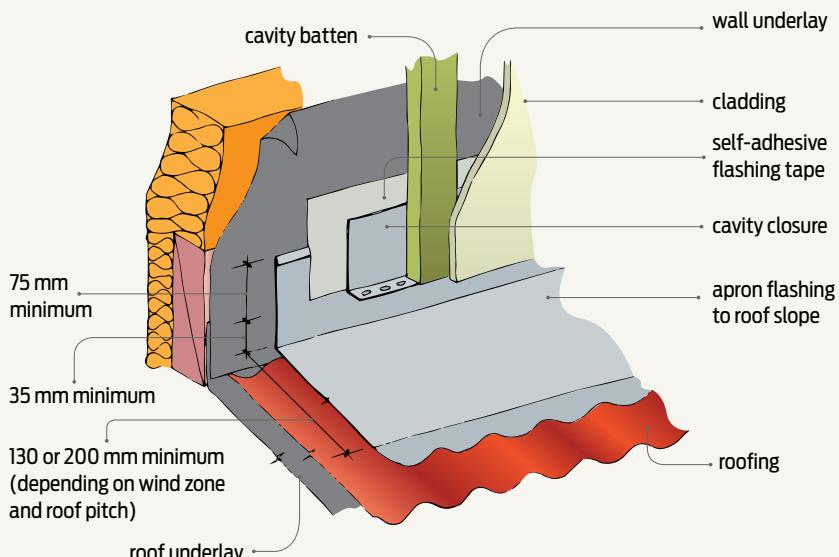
Apron flashing at roof/wall junction – horizontal flashing.
